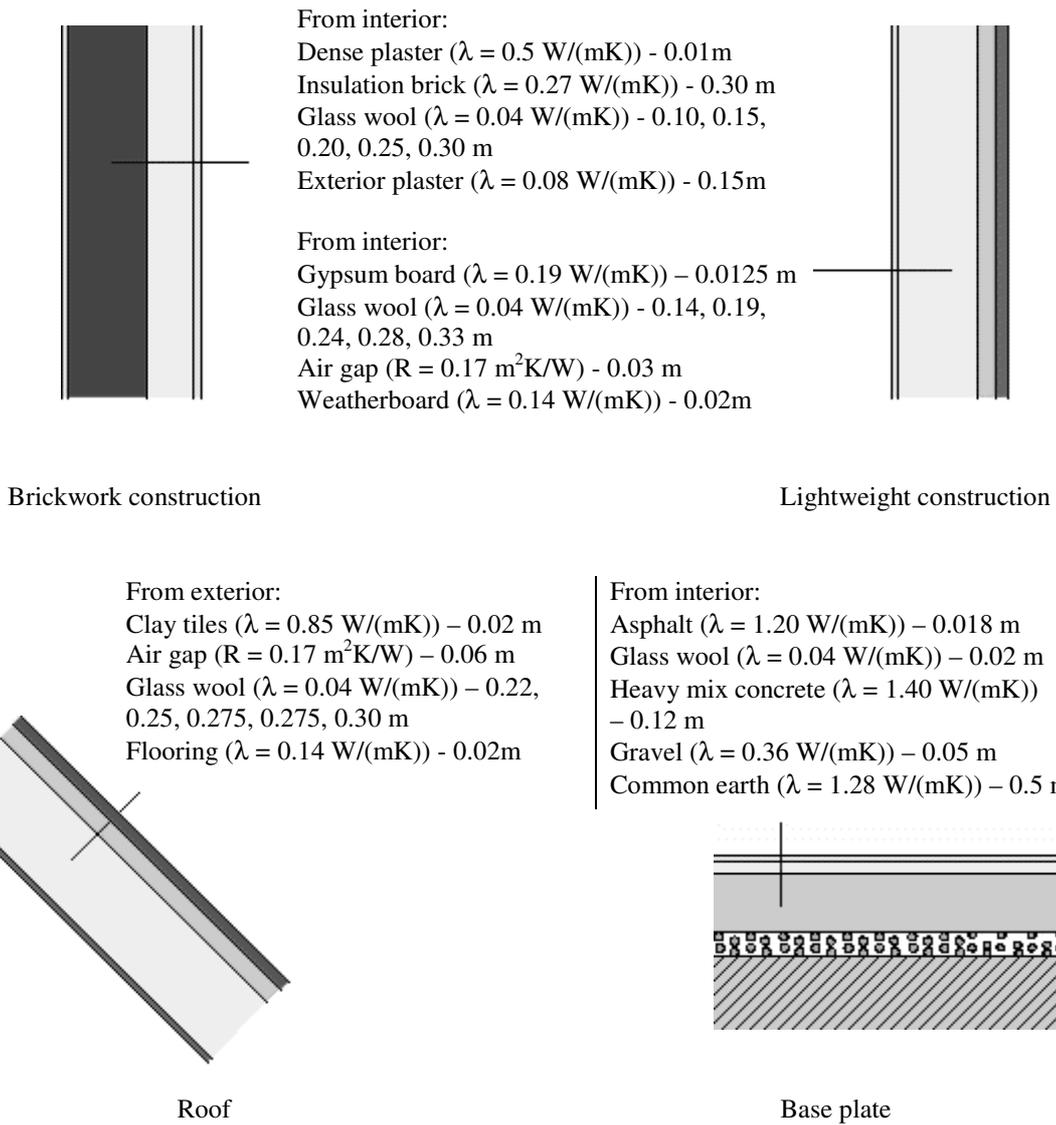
Composition of the main parts of the building envelope as modeled using Capsol's Wall Type Editor
